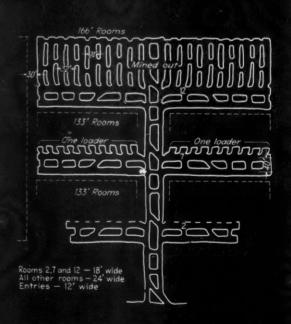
New standard room panel for Orient No. I mine, showing method of driving short, wide rooms off stub entries.
